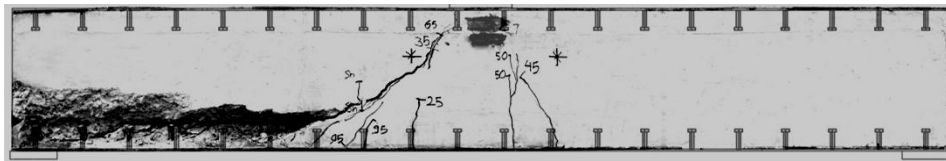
Concrete crack map and failure mode for SP1-1 & SP1-3
